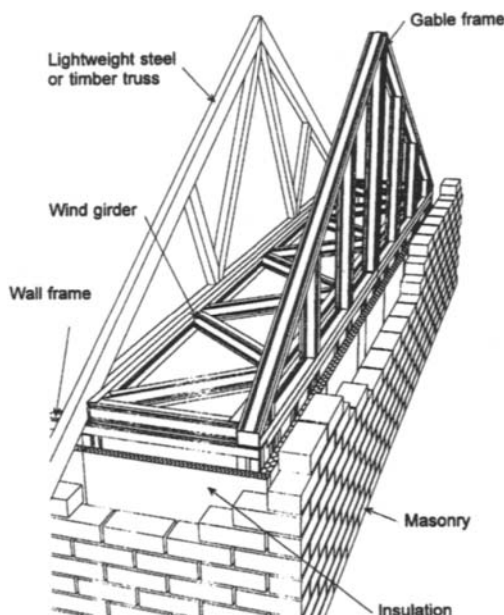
Wind girder at eaves level, Grubb and Lawson (1997)
